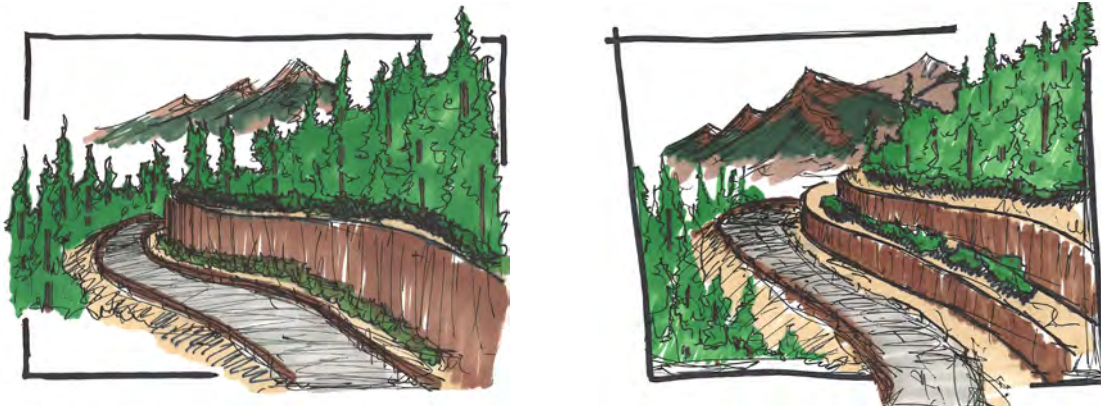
A wall detracting from views (left); a terraced wall with reduced scale to accentuate views (right)
